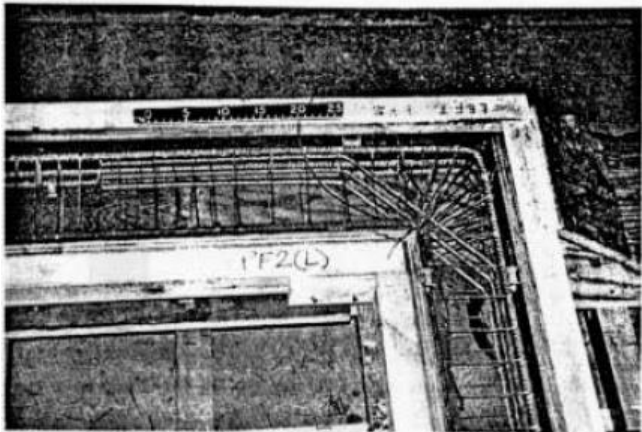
Corner reinforcement at the beam-column intersection (Seraj, Kotsovos, & Pavlovic, 1995).
